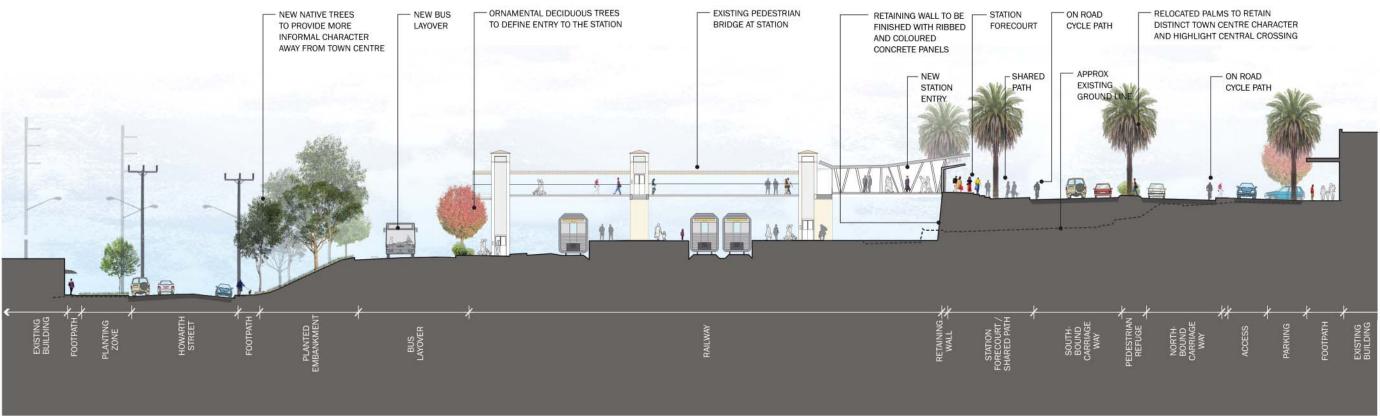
Proposed road cross section C at Ch.1120 (Scale 1:400 @ A3)
